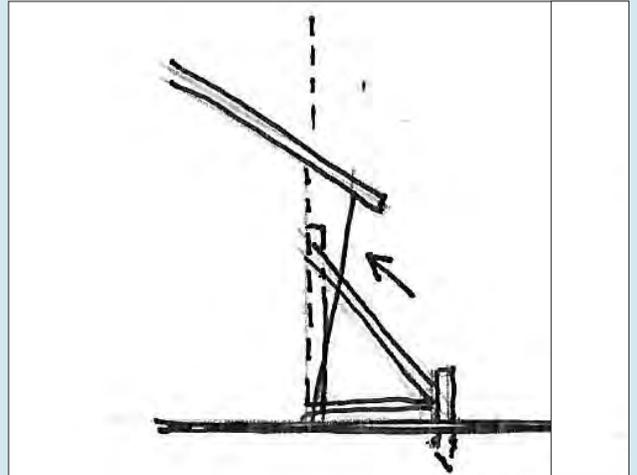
Leaning buildings should be temporarily propped up until a more thorough solution can be found.
